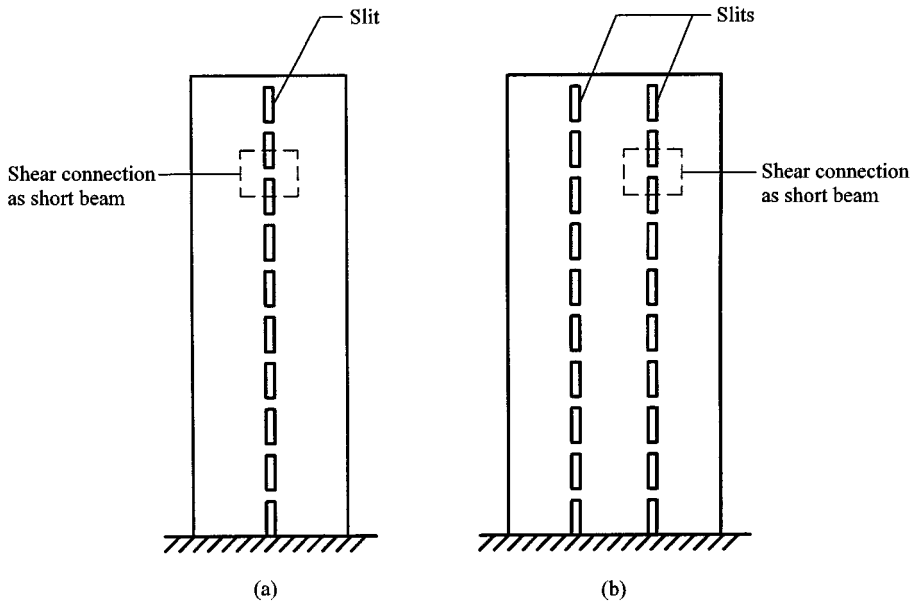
Proposed slit shear wall system. (a) With one band of slits; (b) with two bond of slits.
